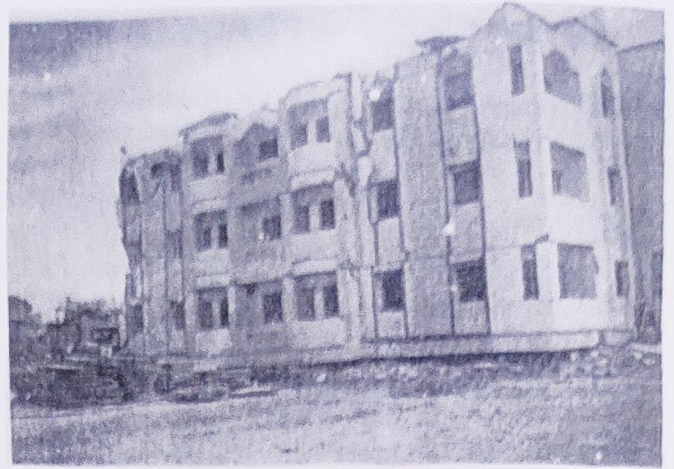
Collapse of apartment building in Ahmedabad owing to open ground story failure. No structural damage is observed in the upper stories.
